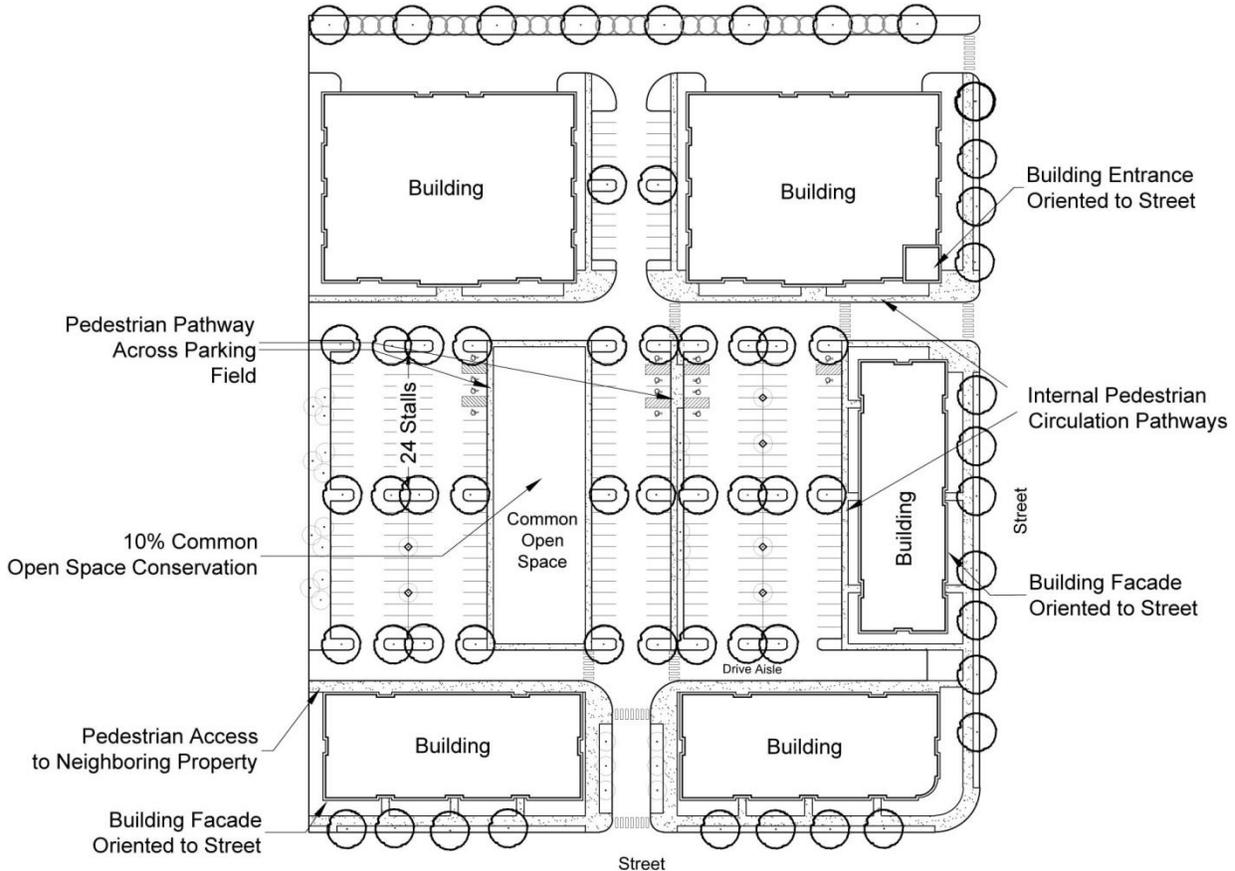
(d). – Site Layout – Pedestrian Standards
